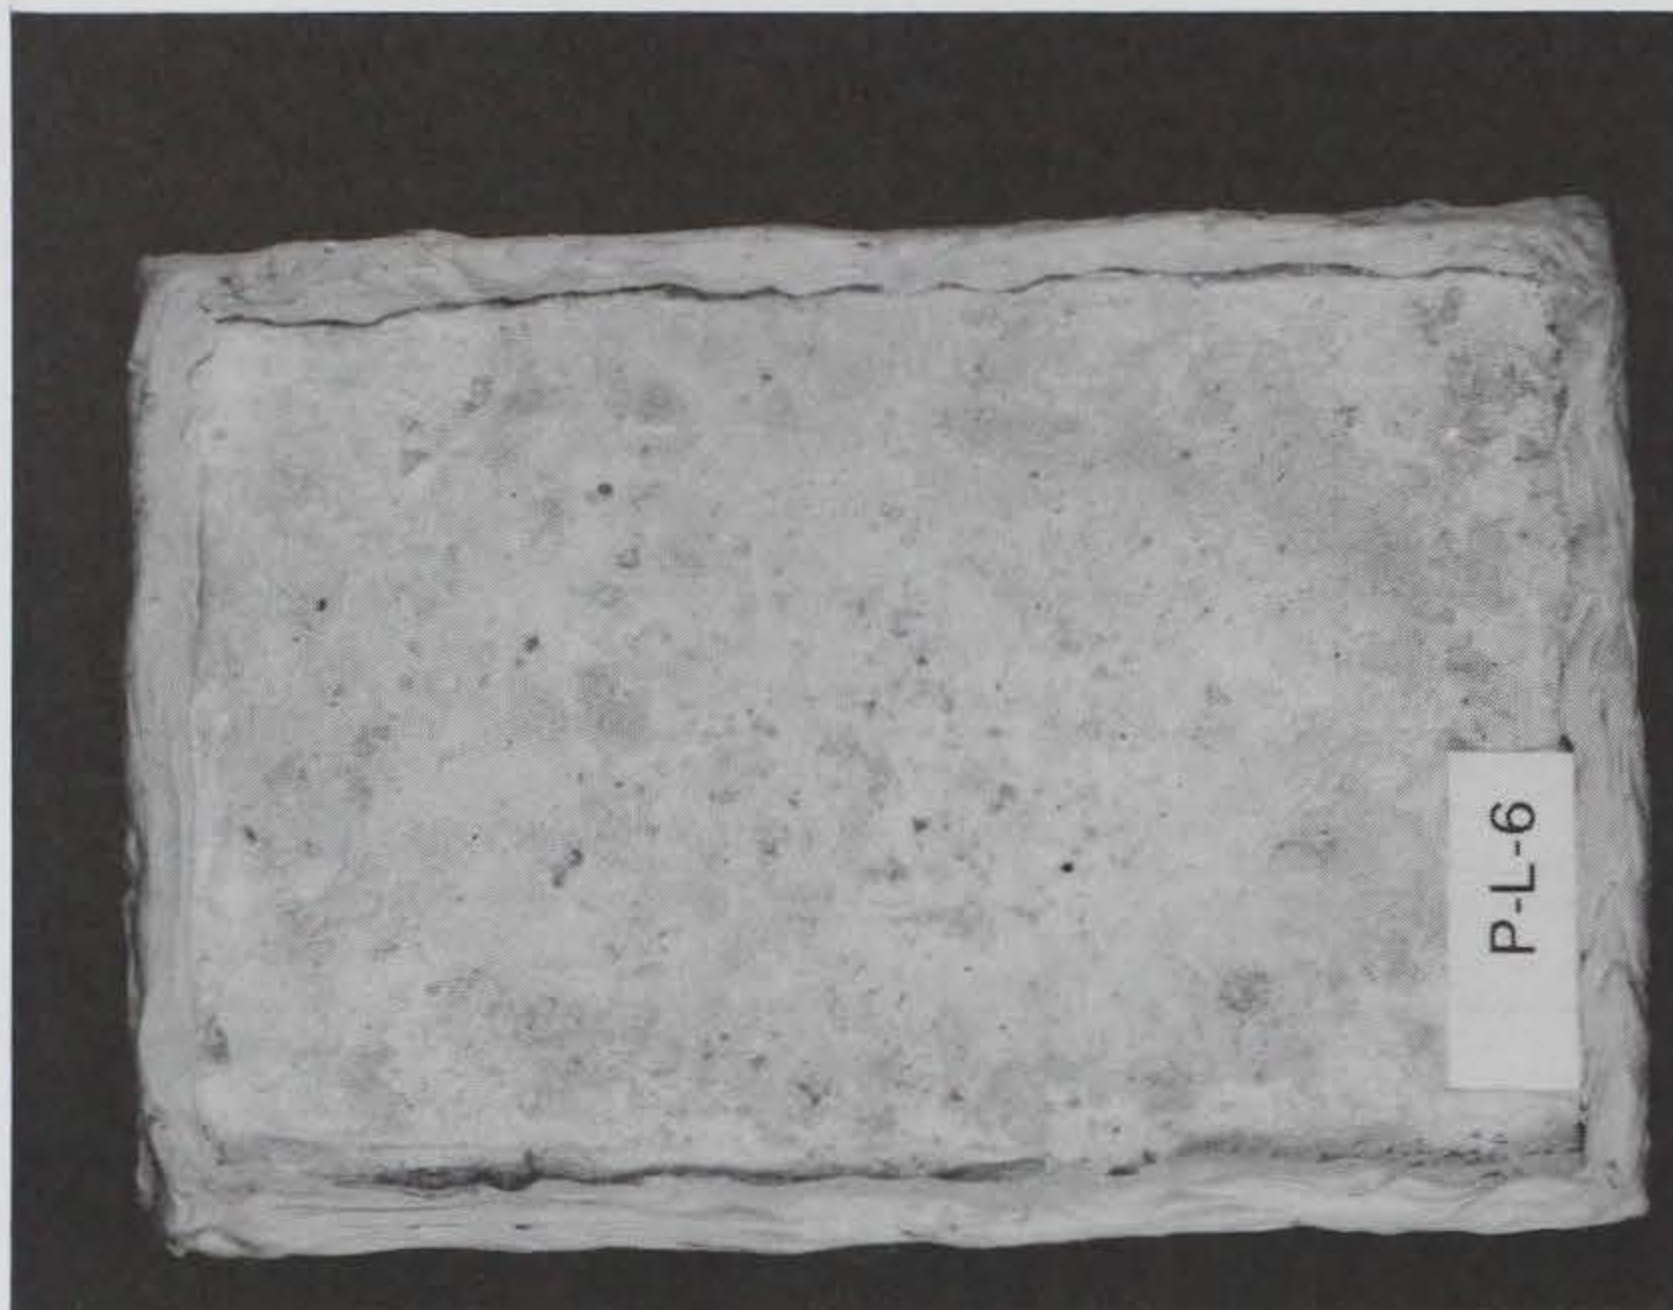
Photo of specimen from mixture L-6 showing slight scaling
